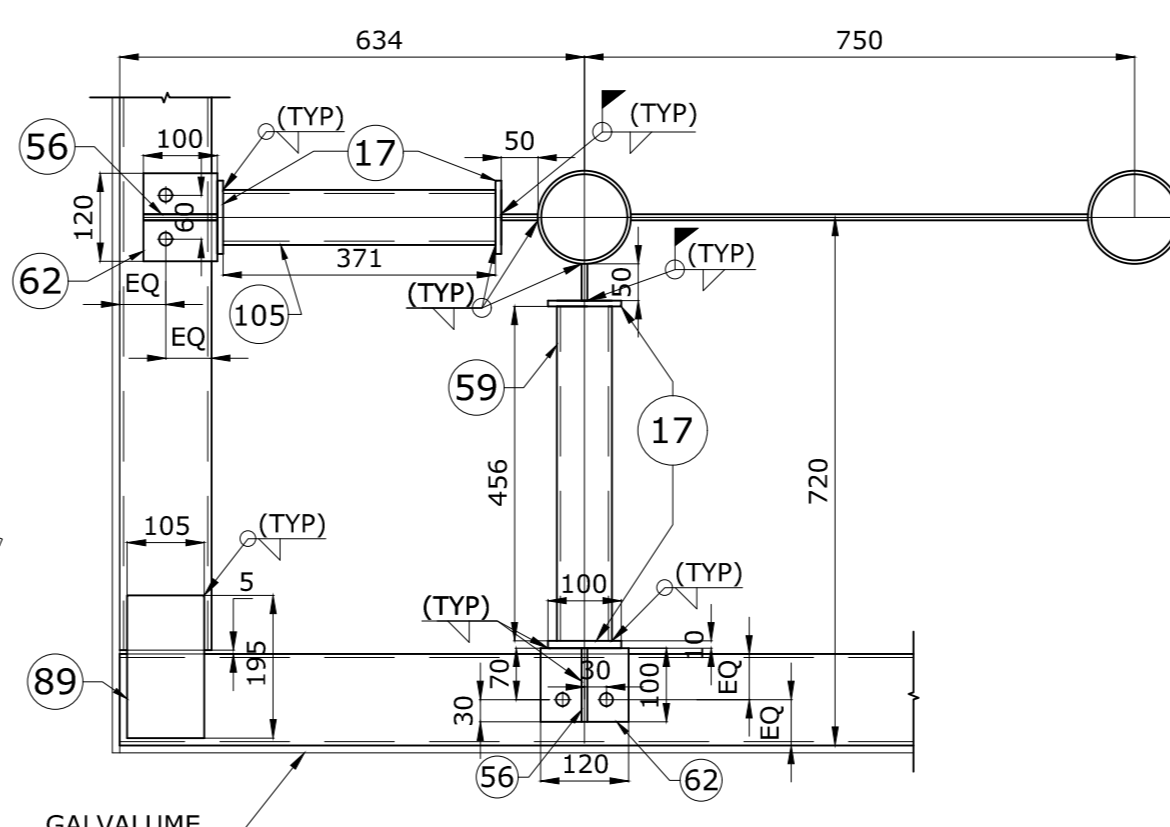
DETAIL - E (CANTILEVER TRUSS CONNECTING TO MAIN COLUMN)
